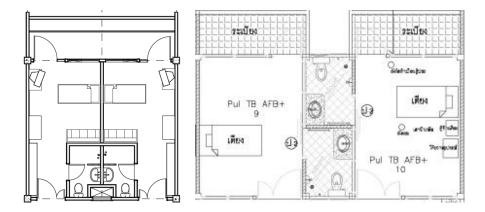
Typical floor plans of naturally-ventilated airborne infection isolation (AII) room
